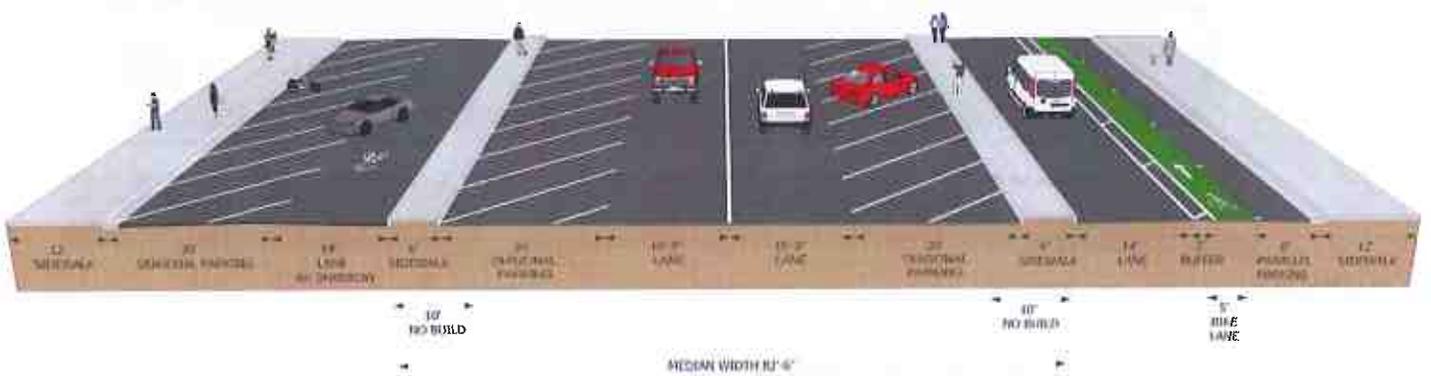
MEDIAN 2 CONCEPT PLAN
